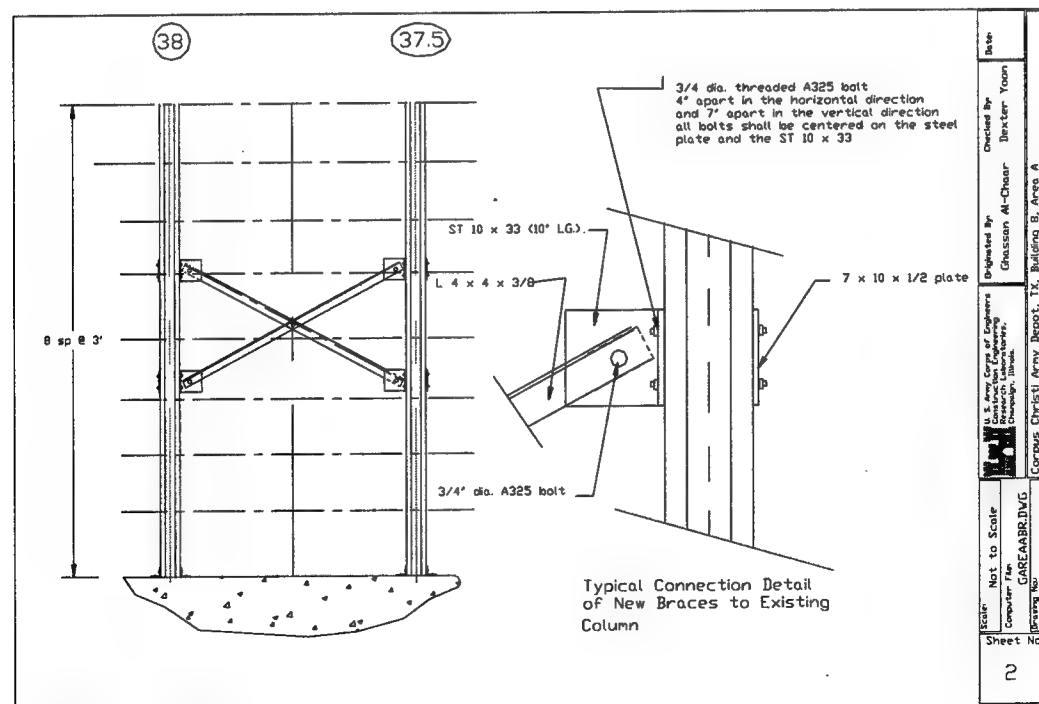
Proposed braces for bay 37.5 – 38 along column line M.
